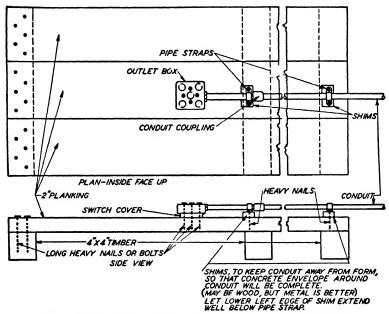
Method of Attaching Conduit and Outlet Box to Wood Forms for Concrete Columns
